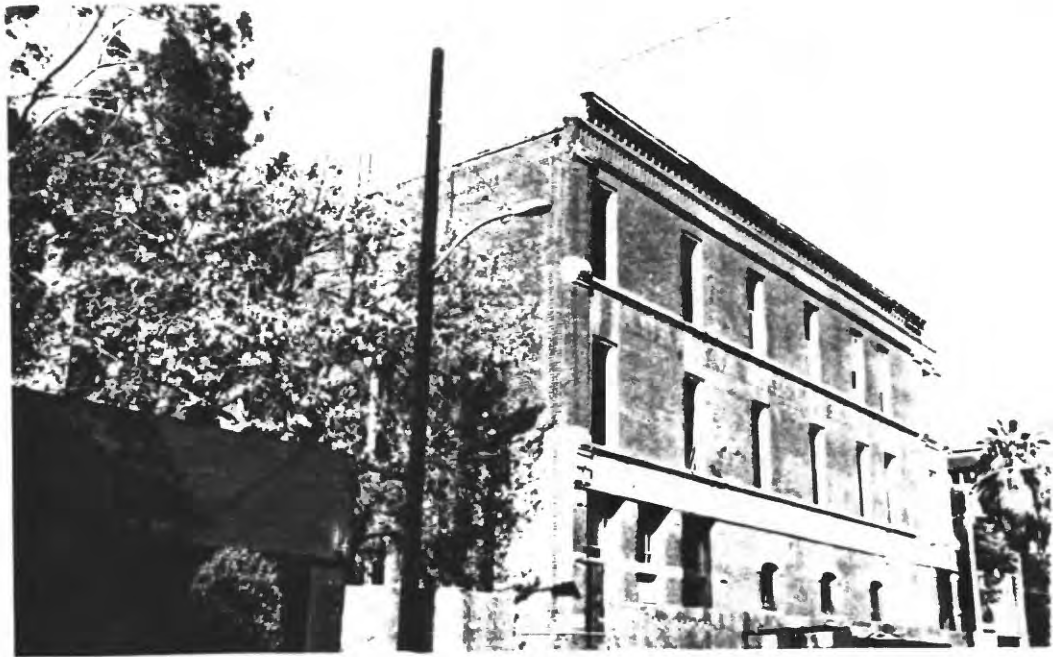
Next to the collapsed building (previous figure), this unreinforced masonry building, being retrofitted, did not exhibit significant damage other than the top part of the back wall.
